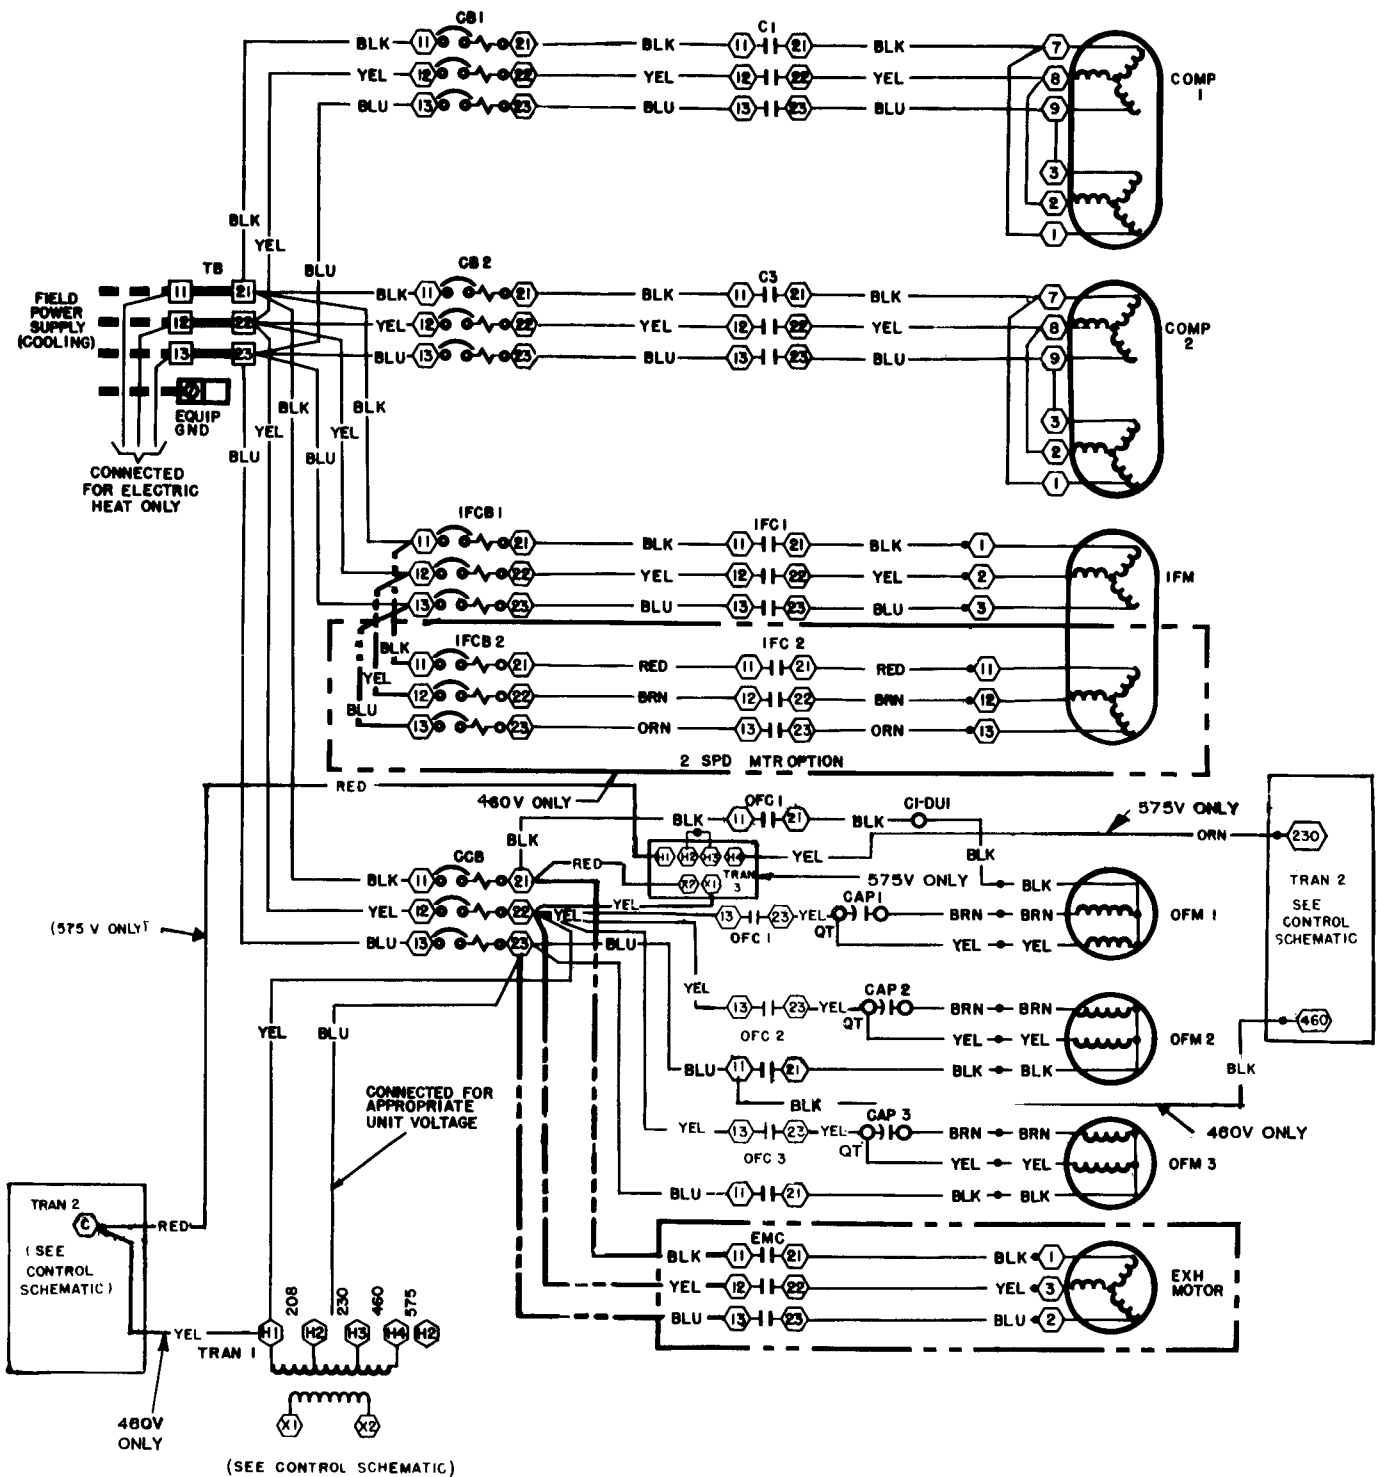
Power Wiring Schematic; 50DL044; 460, 575-3-60
